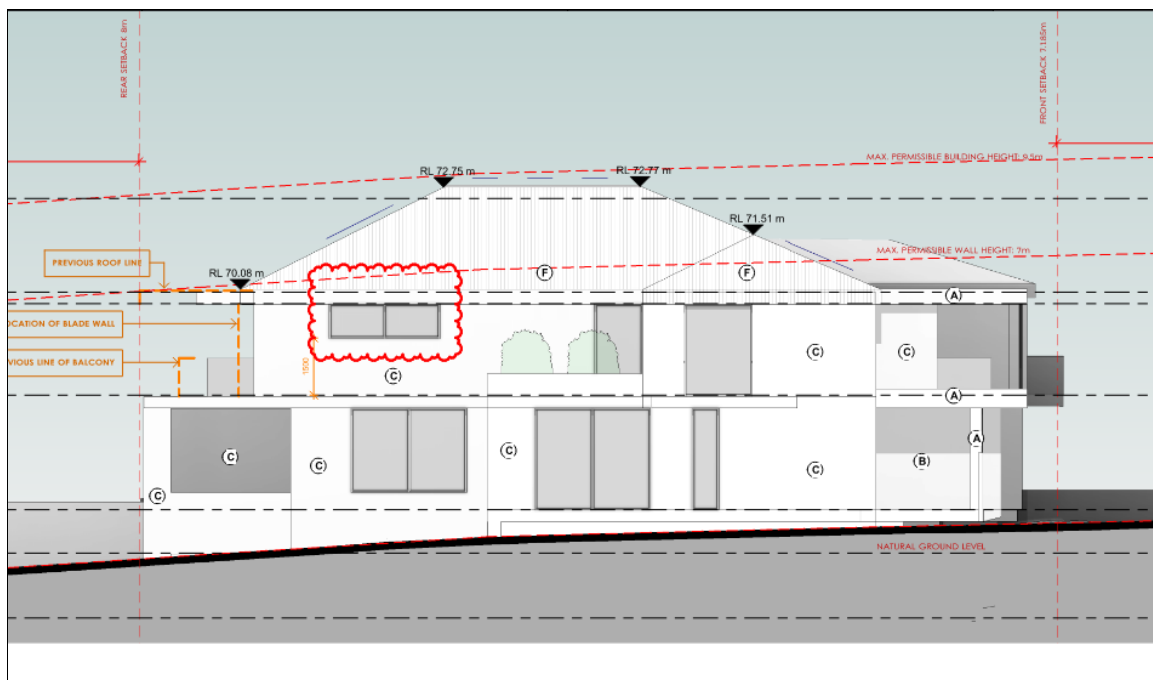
The original application reported to the RLPP with an attic room above each dwelling in a pitched roof form (northern elevation)
